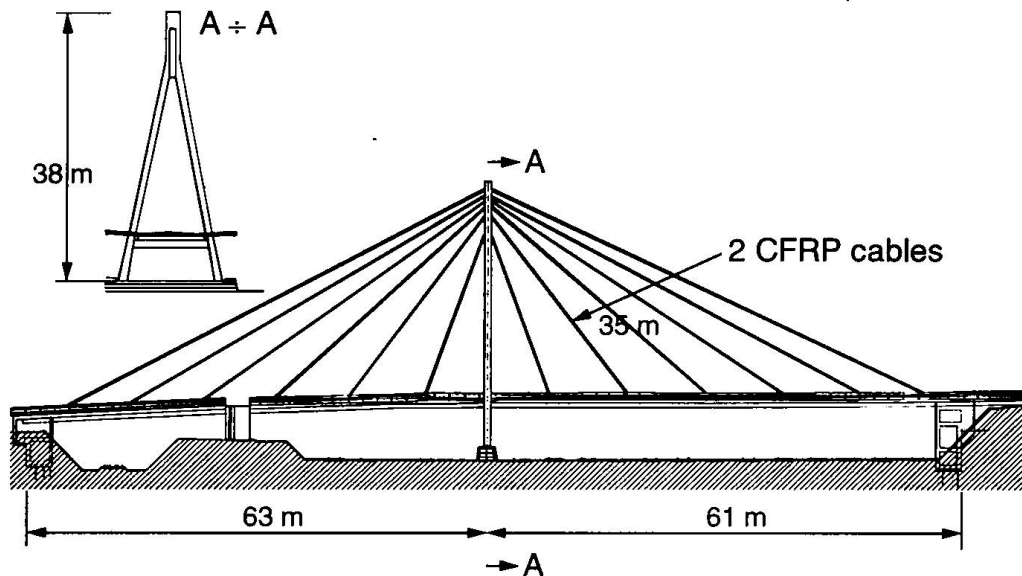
The Storchenbrücke is crossing 14 tracks over the railroad station in Winterthur, Switzerland.
